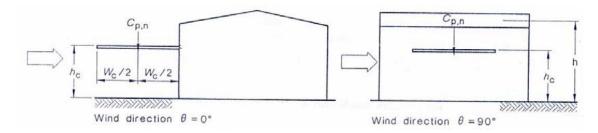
Sloping Roof Building with Attached Canopy (AS/NZS 1170.2:2002)
